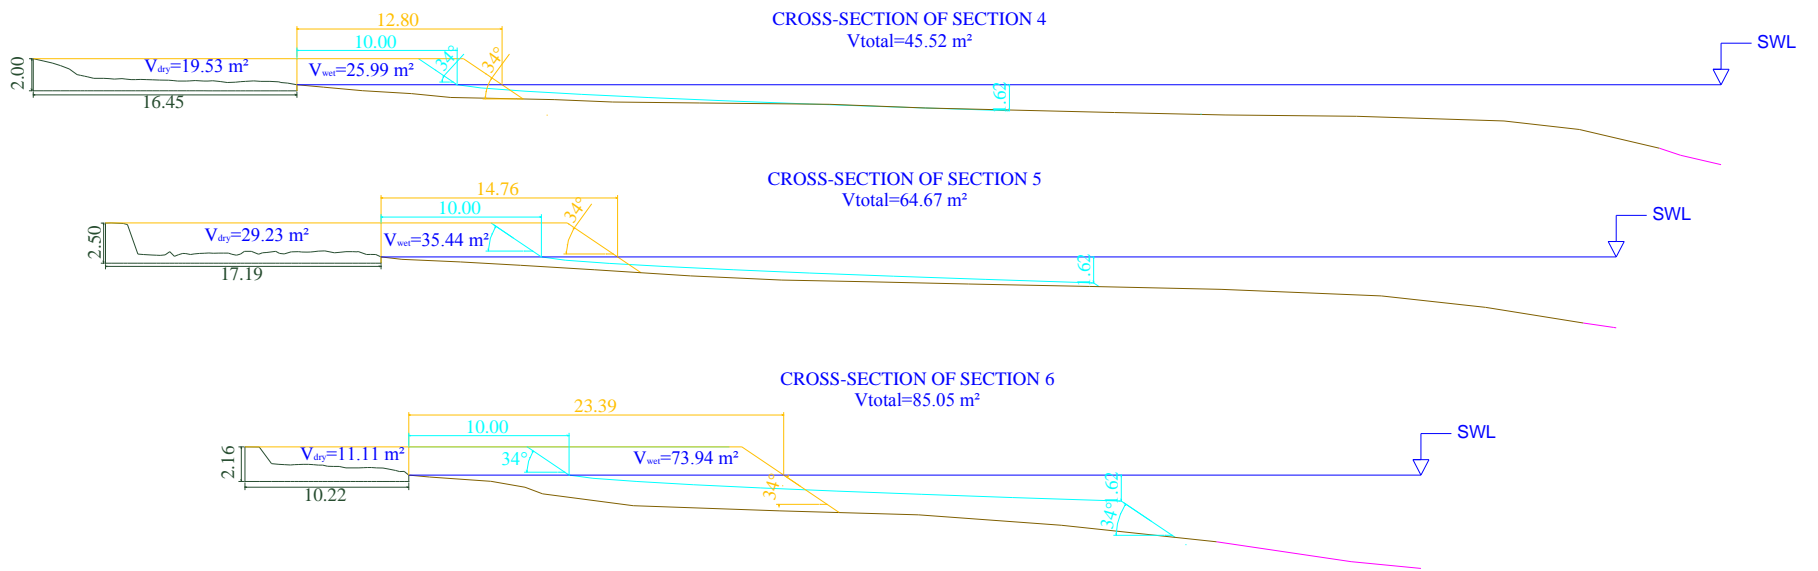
Design profiles of Section 4,5 and 6 for 10 m new dry beach width ($D_{fill}=0.45 \text{ mm}$).
